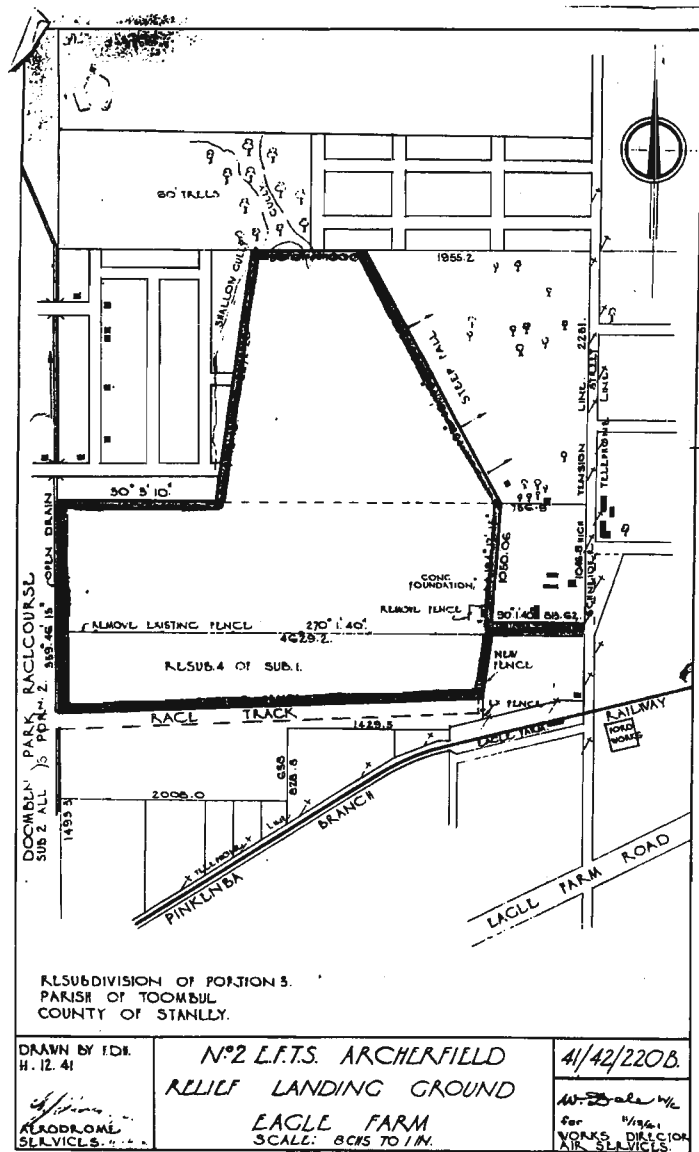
Late 1941 plan of No. 2 EFTS relief landing ground at Eagle Farm
